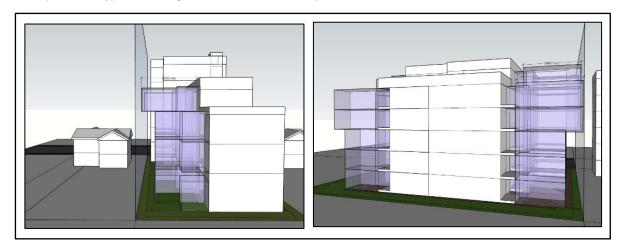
Modelling of 4m principal living room outlook depth standard. Modelling showing notional 6 storey development alongside an existing notional 2 storey dwelling. Figure 12: Modelling of 8m principal living room depth standard. Modelling showing notional development informed/encouraged by the standard including measurement from balcony edge where provided.
